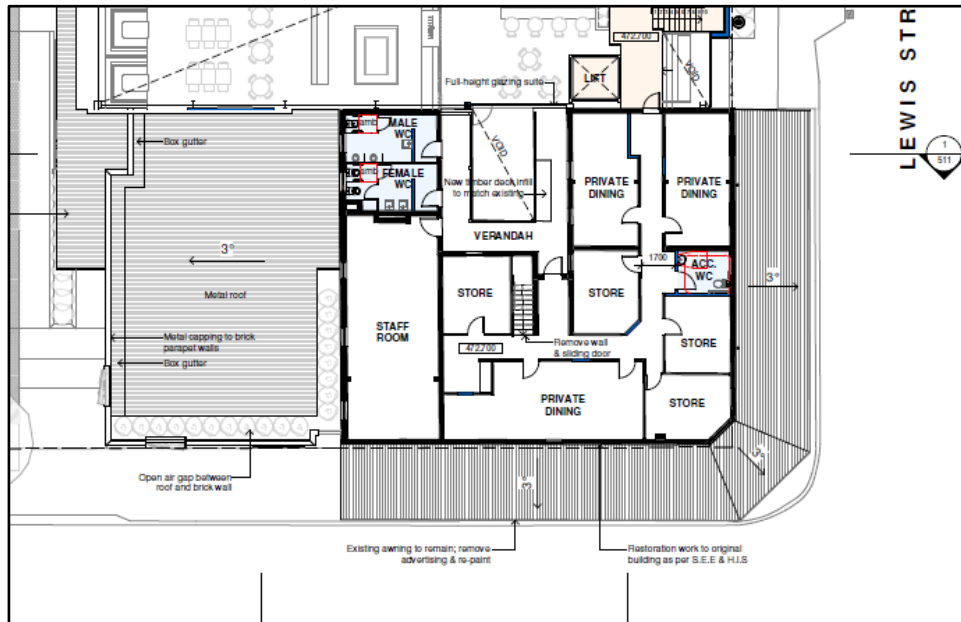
Extract from approved Upper Level 1 Plan of DA0140/2024 showing upper floor of Federal Hotel
